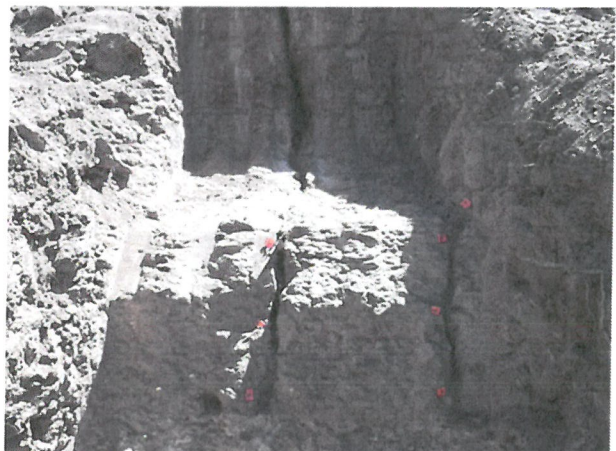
A2-9 – T-12 location: Looking southwest into trench at continuation of crack in floor through the chimney drain to the left to the downstream embankment to the right. Two separate crack are located in the floor of the trench and appear to converge in the northwest wall.
